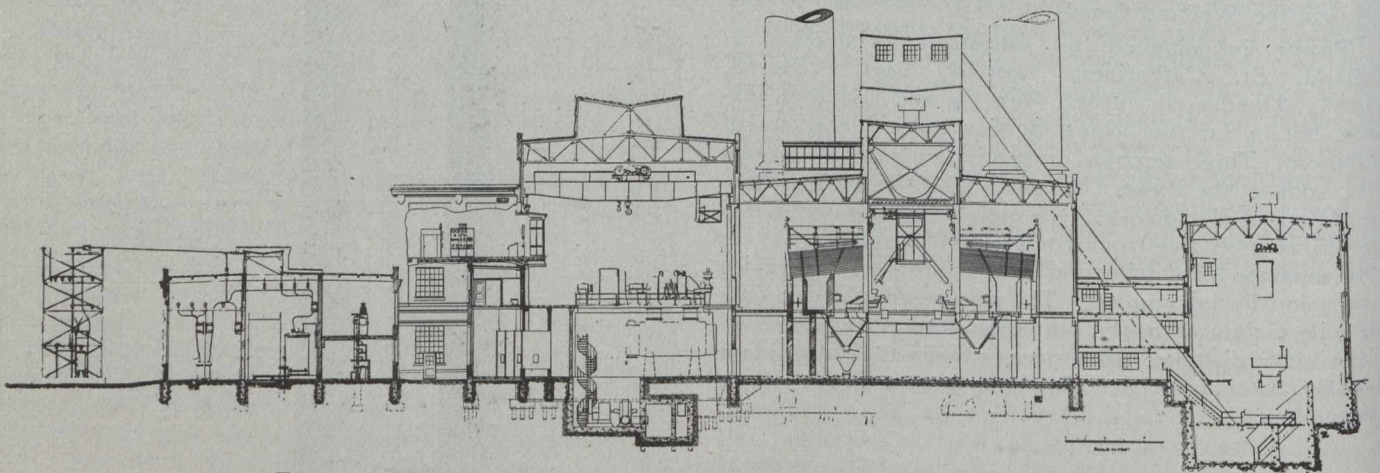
Sectional View Showing Arrangement of Equipment.
